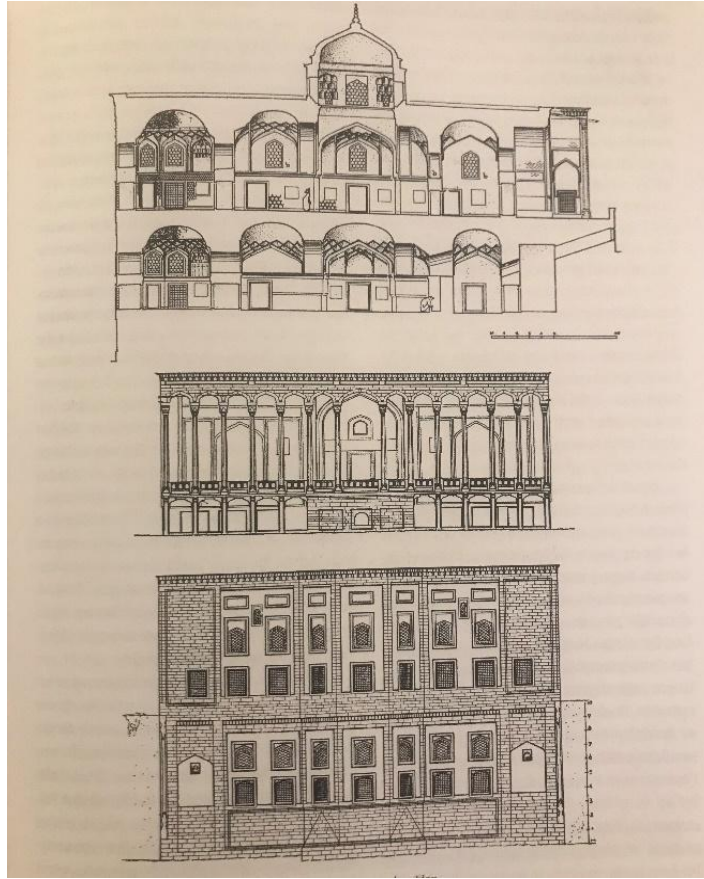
Elevation and facade drawings of Tiled Kiosk.
